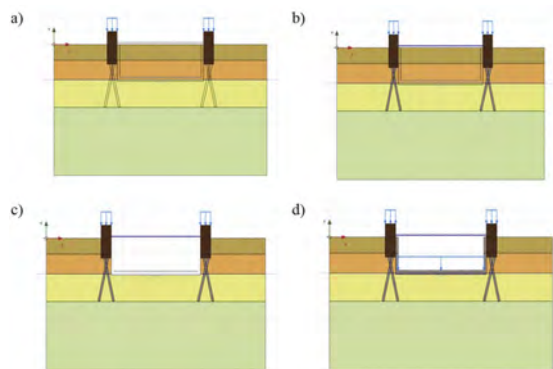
Calculation scheme with taking into account the sequence of work: a - before basement floor construction; b - installation of piles and tie girder; c - soil excavation to the depth of the basement; d - after basement floor construction.
